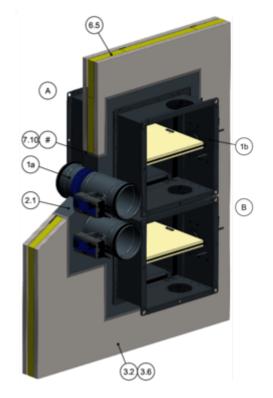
Mortar-based installation into a lightweight partition wall, below a flexible ceiling joint
